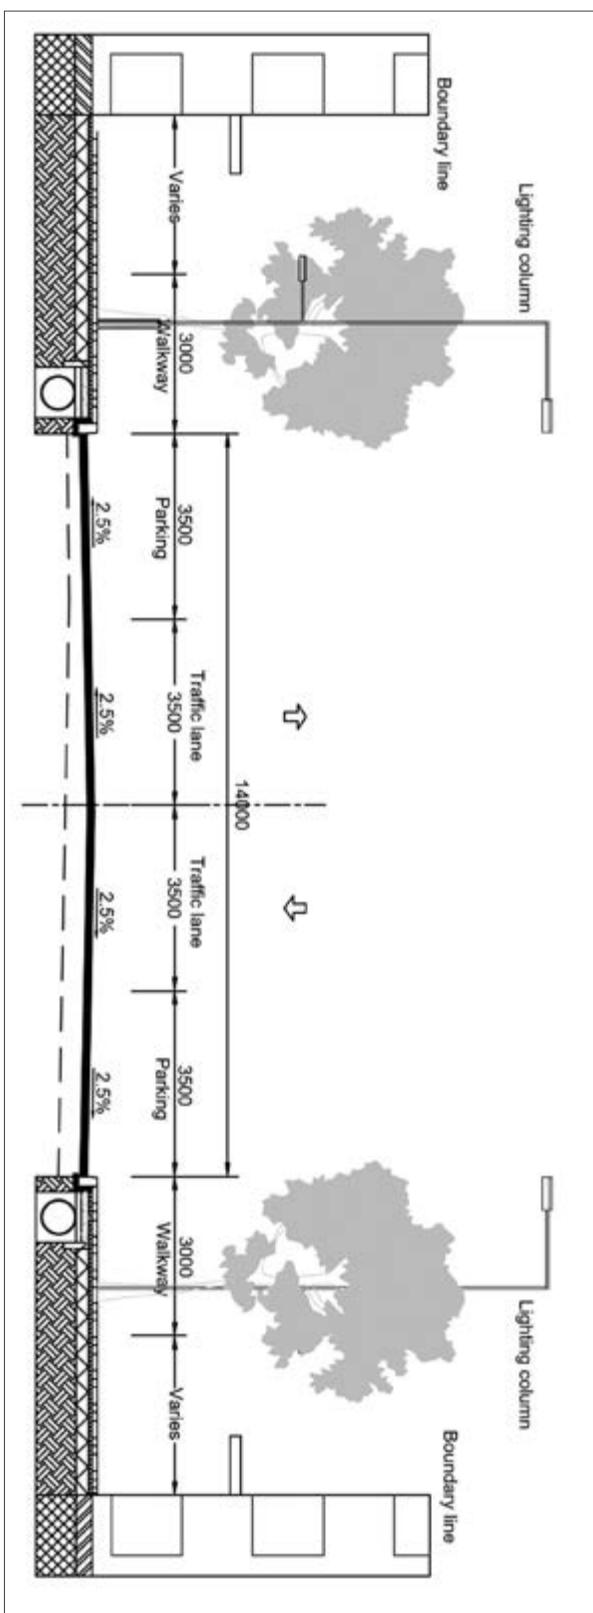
Urban Local Street (On-street Parking, Pedestrian and Cyclist Lanes)
